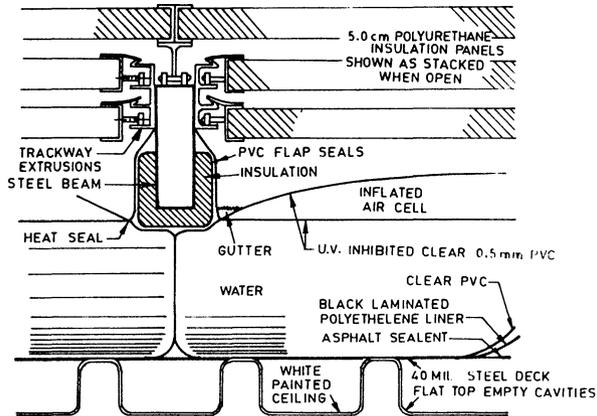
CROSS-SECTION OF WATER BAG AND PANEL SYSTEM OF ATASCADERO 'SKYTHERM' HOUSE
